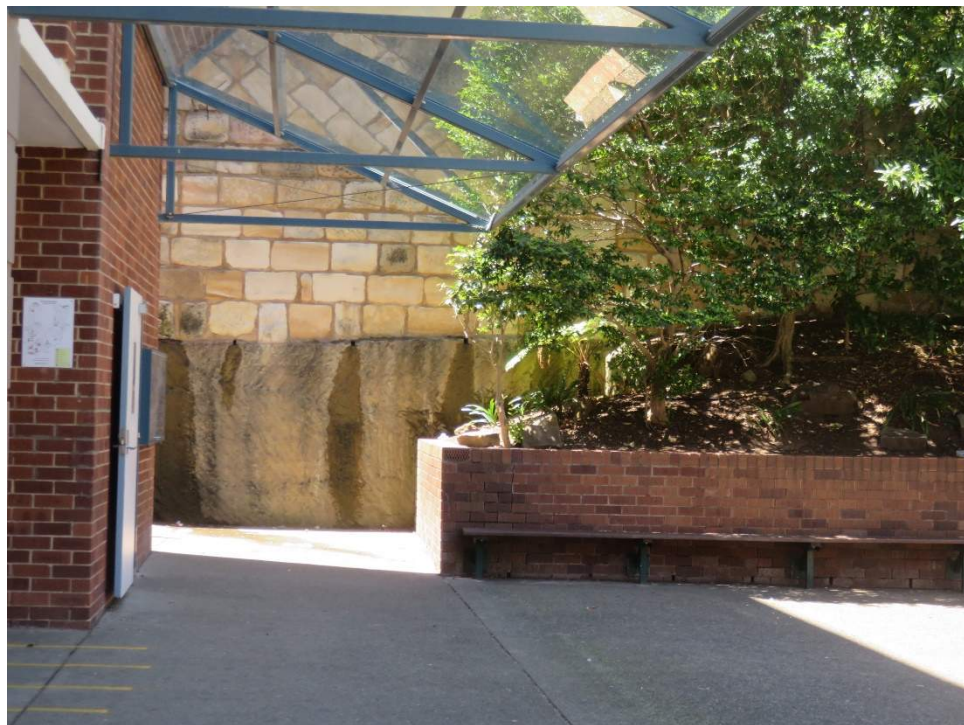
View looking east at exposed, worked natural sandstone bedrock with sandstone block eastern boundary retaining wall above. The wall extends across the study area. The natural sandstone drops below the present ground level midway across the garden area.
